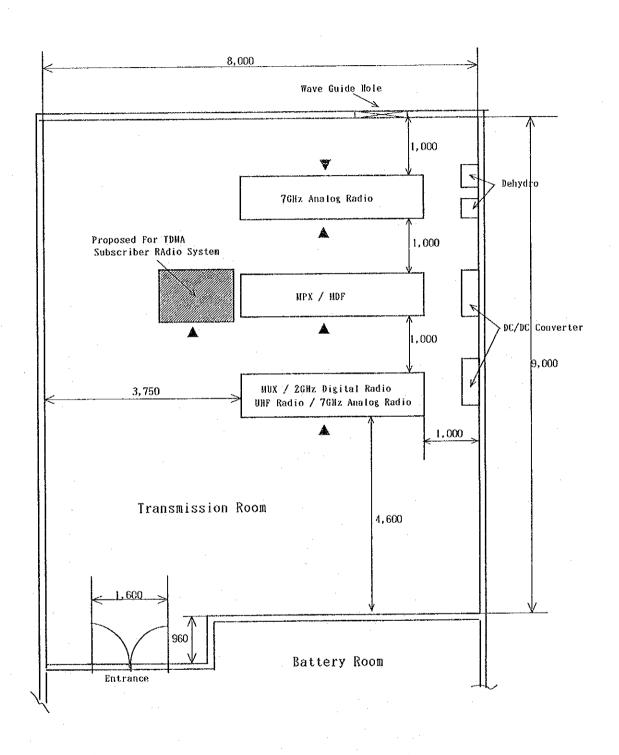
Equipment Layout Plan for NTONDOZI Repeater Station
